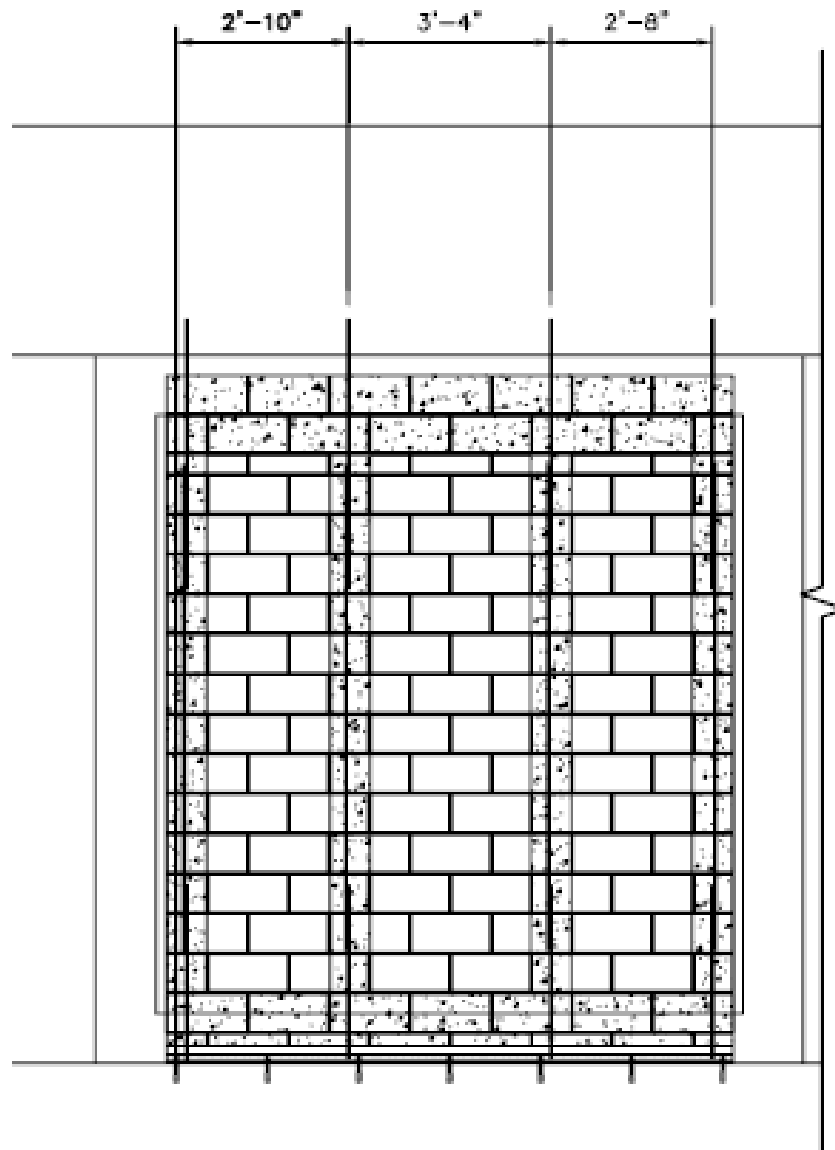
Front View Showing Rebar and Grouted Cell Locations for the 6-inch CMU Panel
